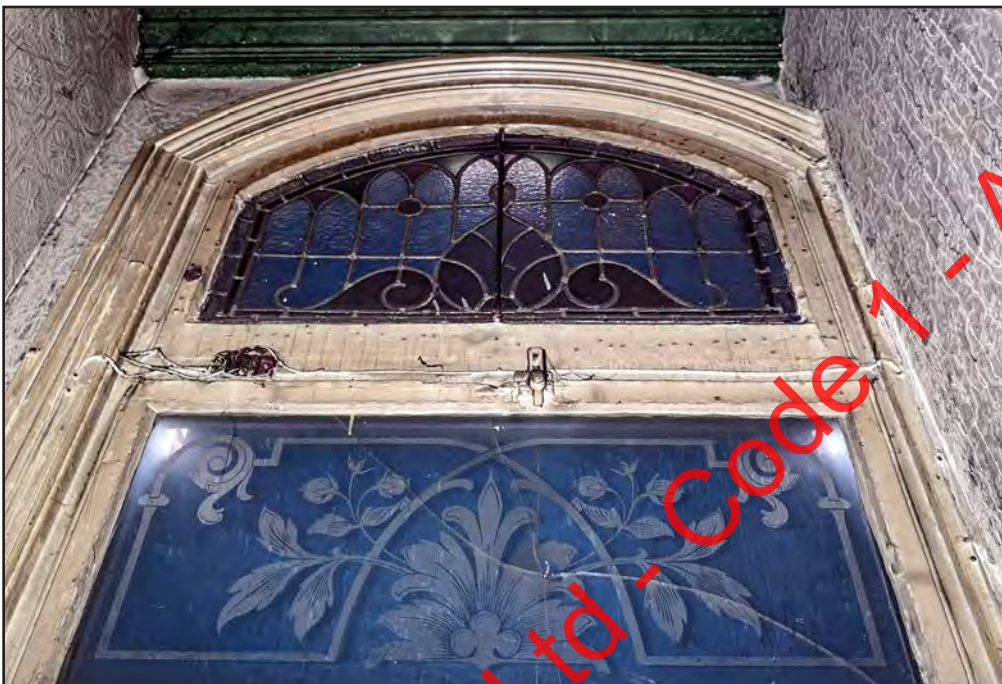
Window above doorway in New Canal Street entrance (photograph taken by Holland Contracting)
